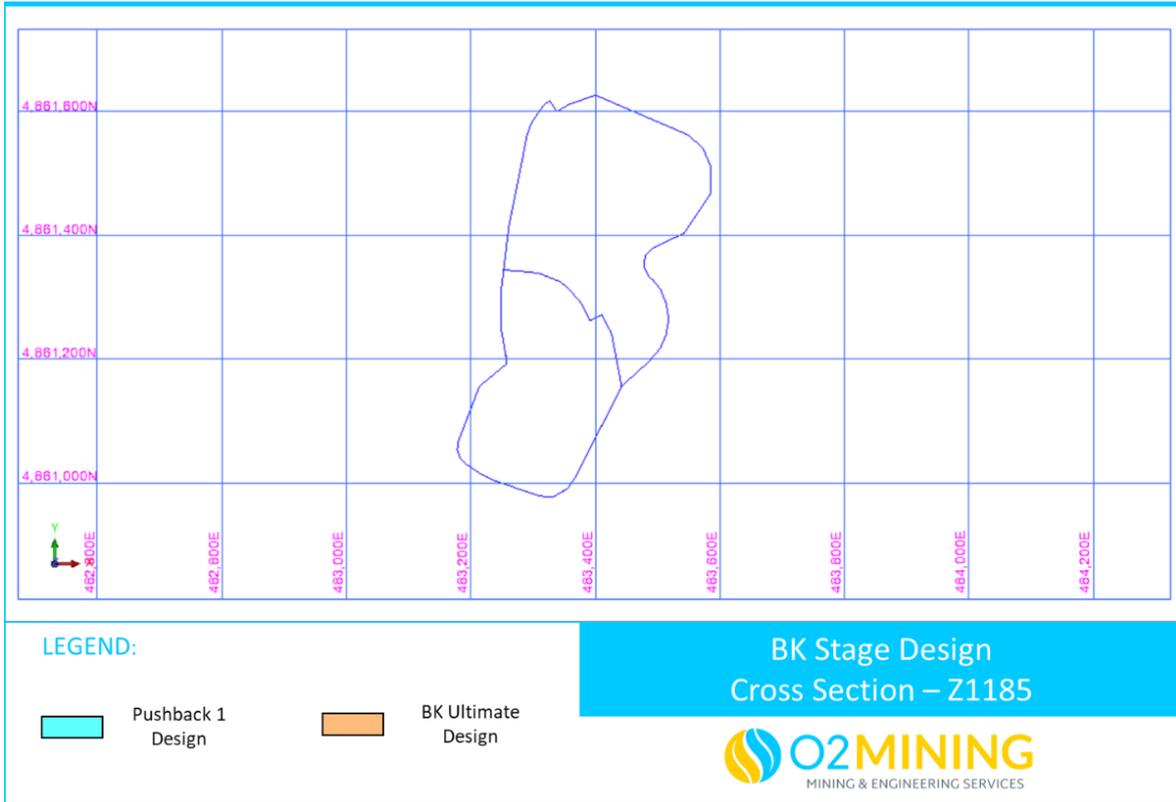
BK Stage Design Elevation Section – Z1185 (Source O2 2023)
